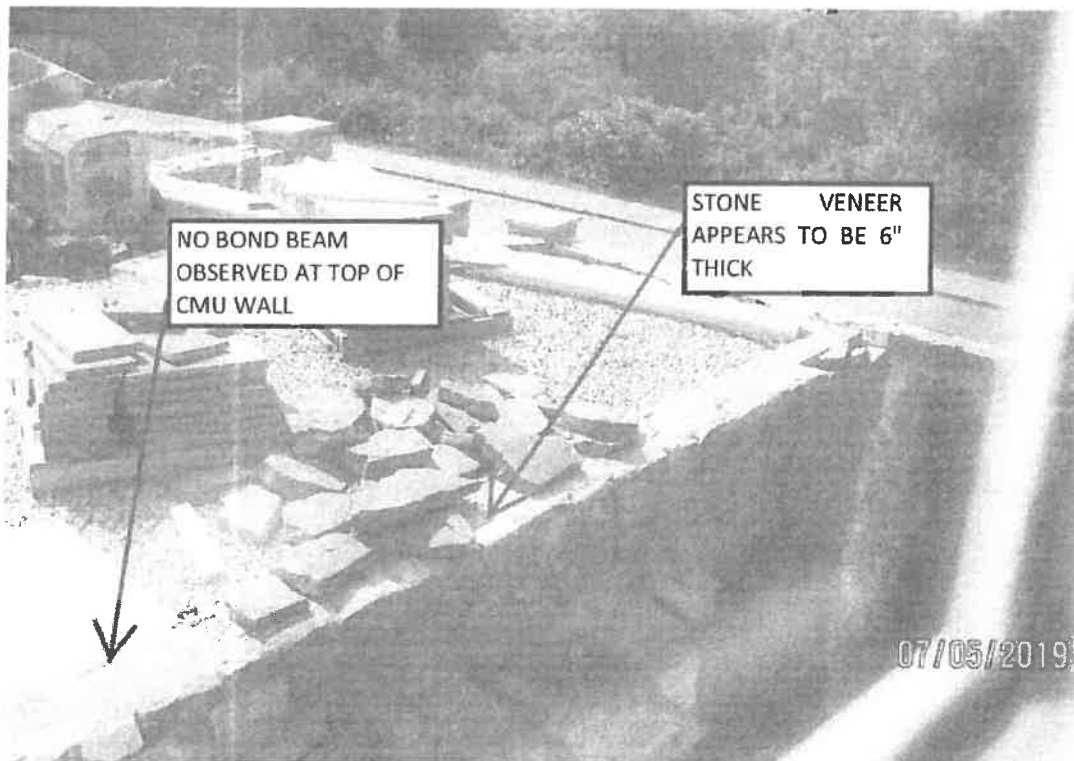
(by others) – Concrete masonry block does not appear to have a bond beam at the top and therefore likely has no horizontal reinforcement.
